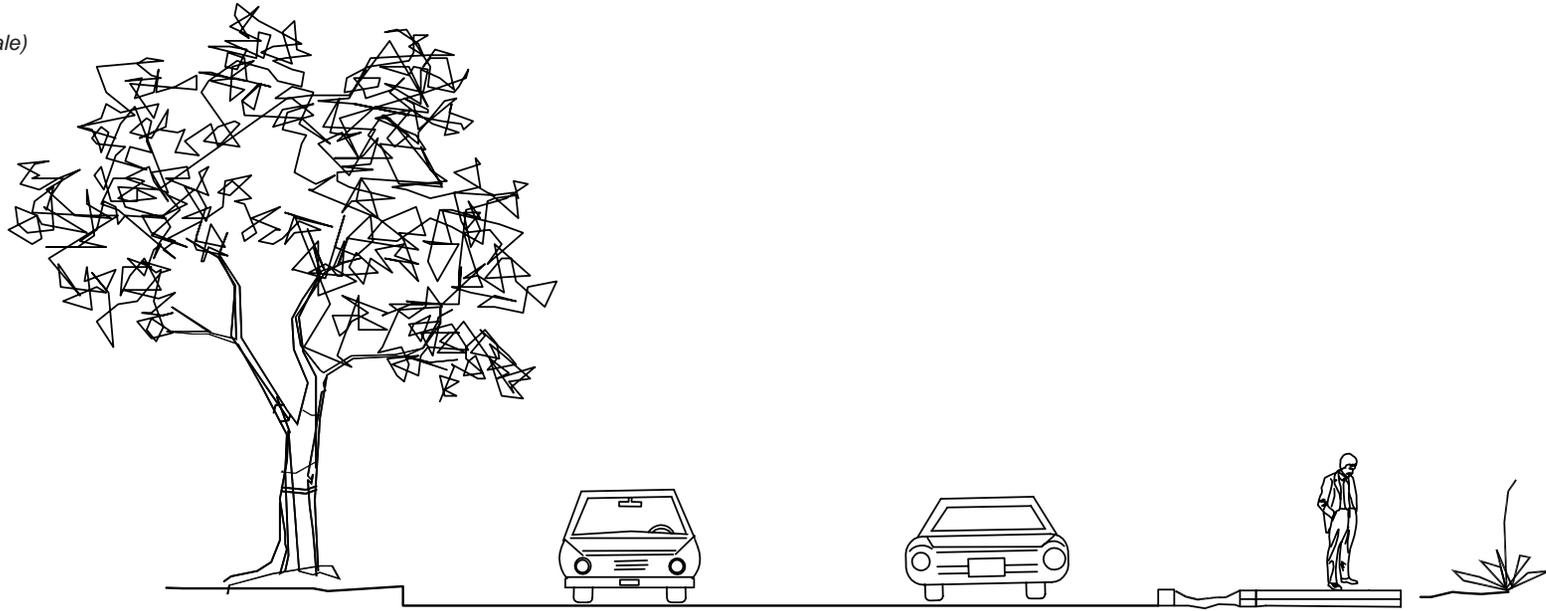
D-1 - Street Section: Wyatt Drive (adjacent to PAD District Boundary)
